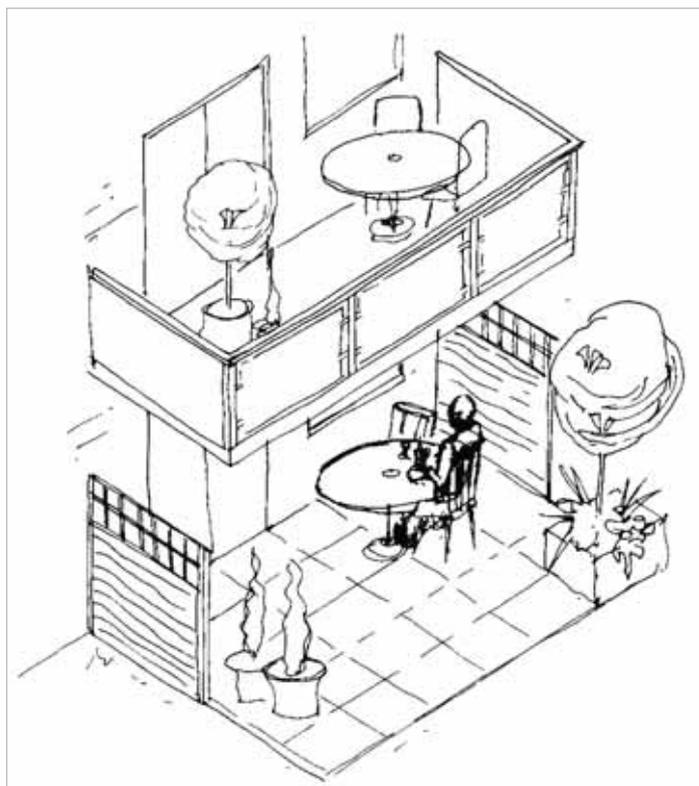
Wherever possible some modest sunlit area for sitting out should be provided.
